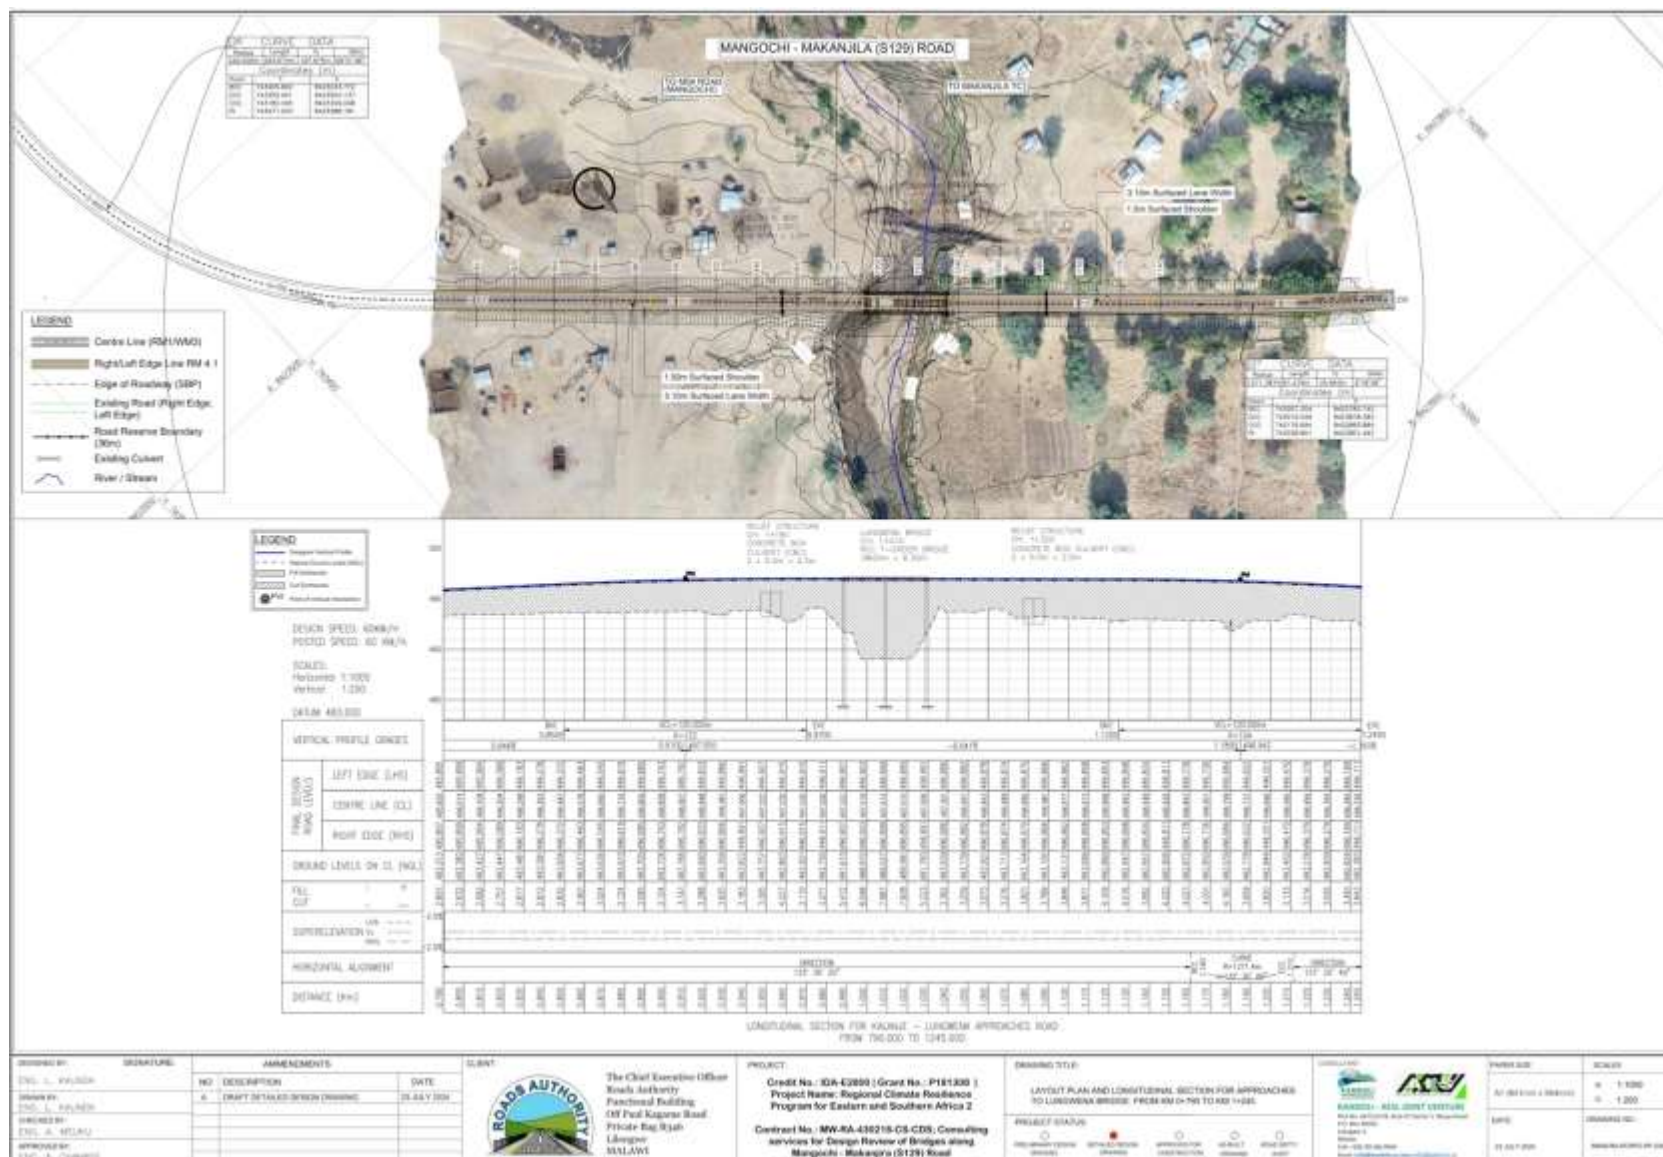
Lungwena Bridge Layout Plan and Longitudinal Section for Road Approaches
